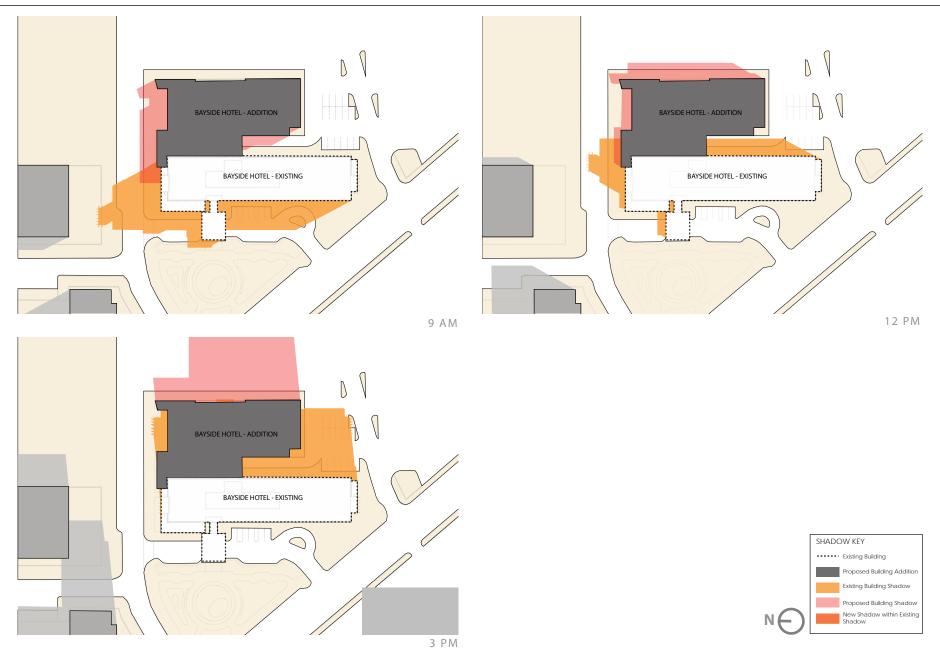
Shadow Study, March 21 Source: Arrowstreet, 2014
